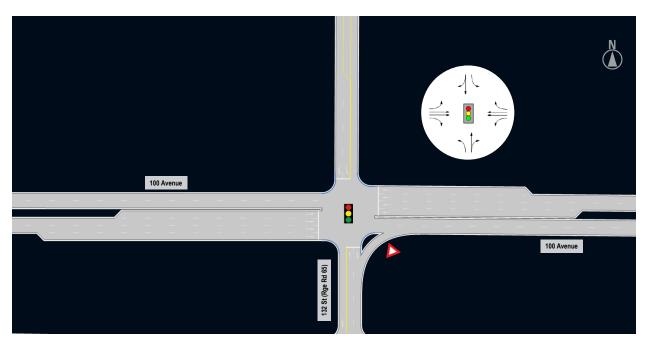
Proposed 100 Avenue & 132 Street/Range Road 65 Upgrades
